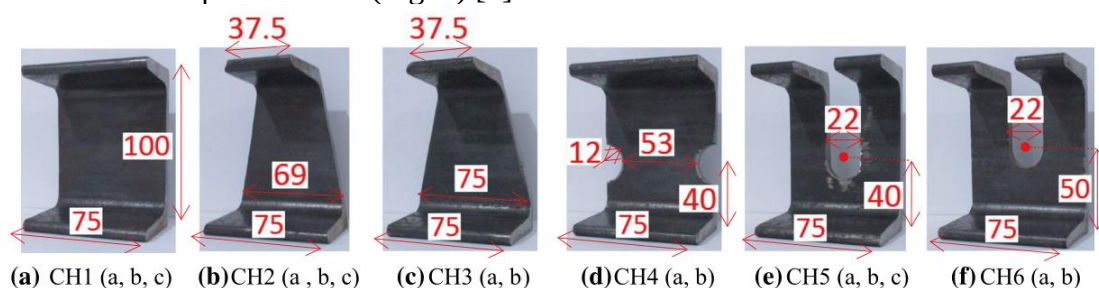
The geometric details of ordinary and new channel connector shapes for each group (unit: mm) [1]
